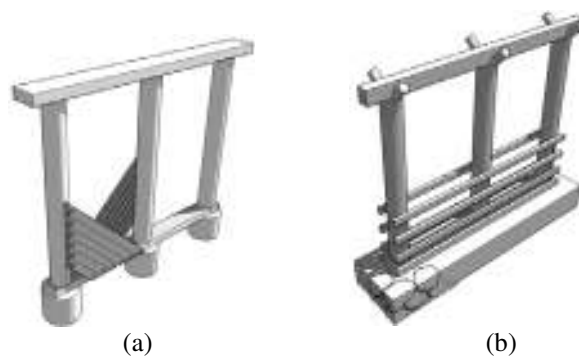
Zogali walls with: a) skewed, b) horizontal planks
